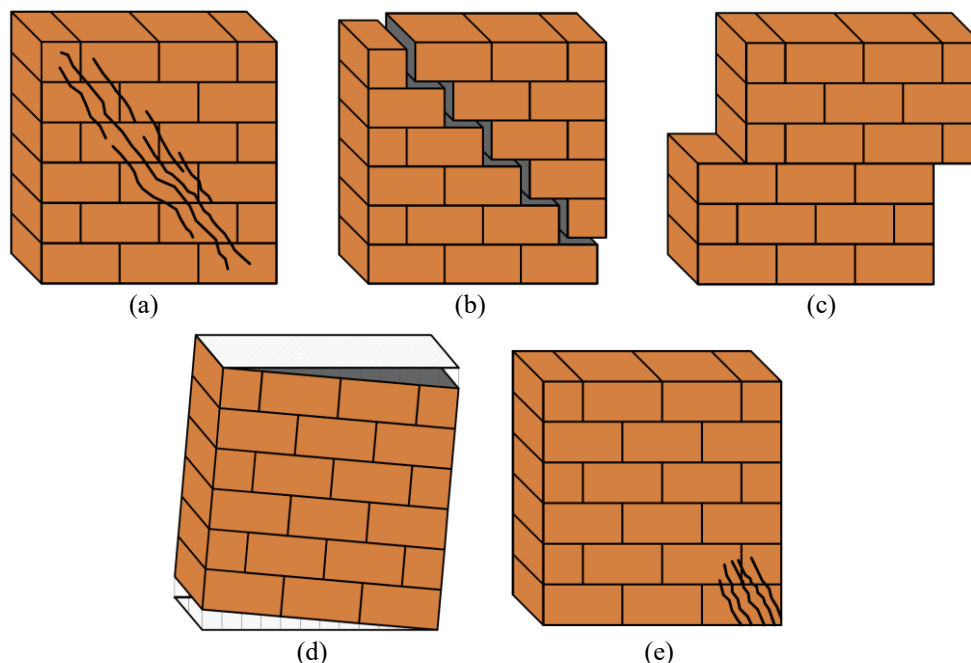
In-plane failure modes of URM components: shear diagonal cracking – (a) stepped cracking and (b) straight cracking; (c) shear sliding; (d) flexural failure; (e) toe crushing
